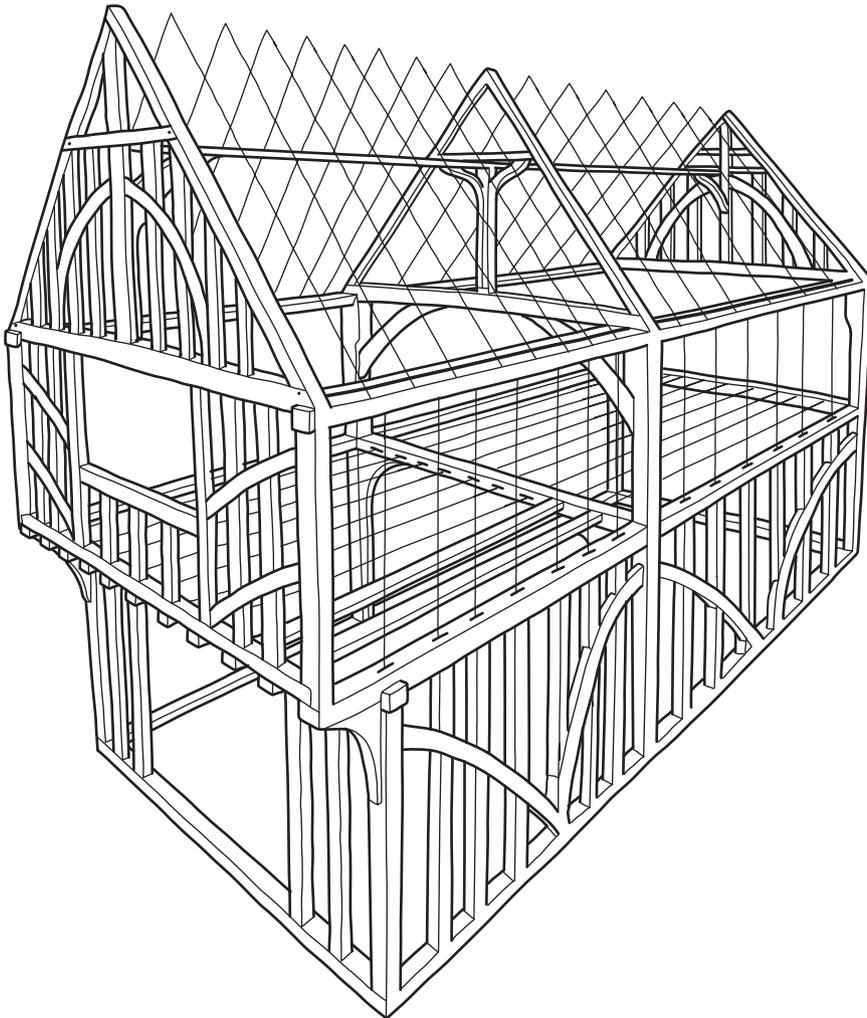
Two storey structure [Drawing after Hewitt (Ref 29)]
